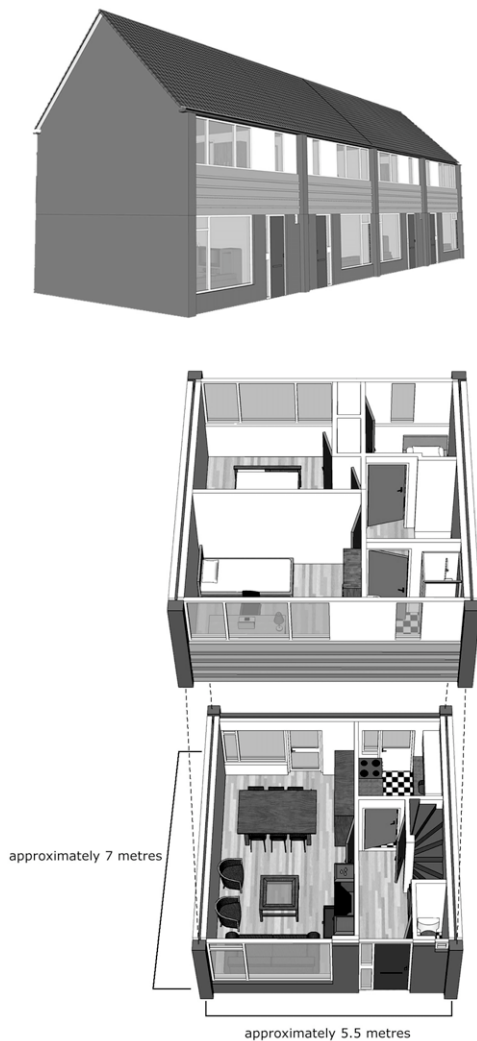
Typical plan of a Dutch post World War II terraced house. On the ground floor, the right bank holds stairs, a toilet, a hall and a kitchen and the left bank holds the living room. On the first floor, a bedroom, a hall and a bathroom can be found in the right bank. The left bank holds two bedrooms.
